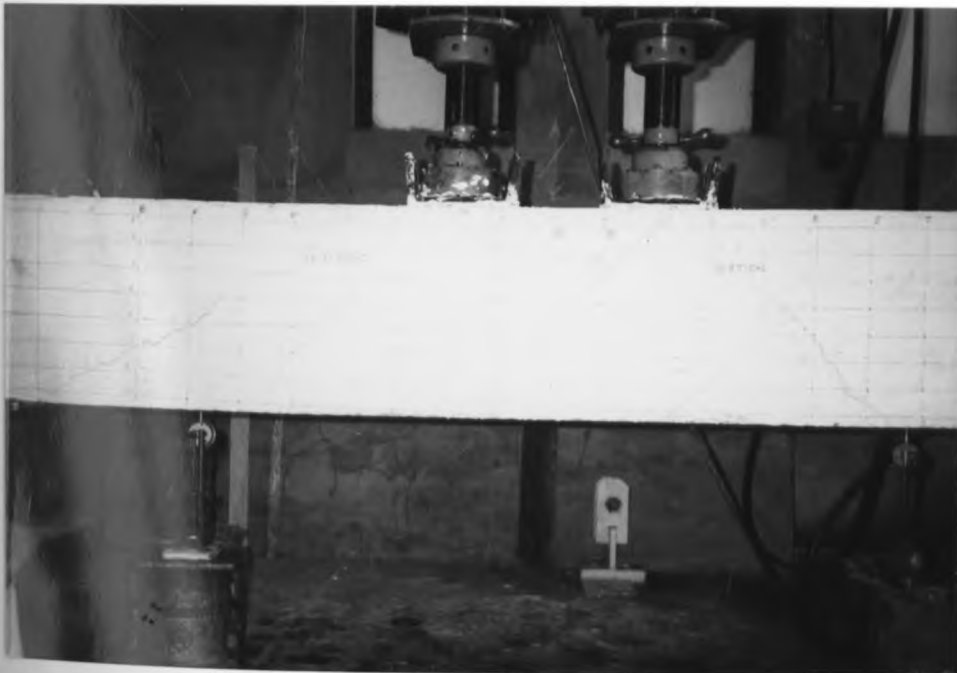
TYPICAL TEST ARRANGEMENT
